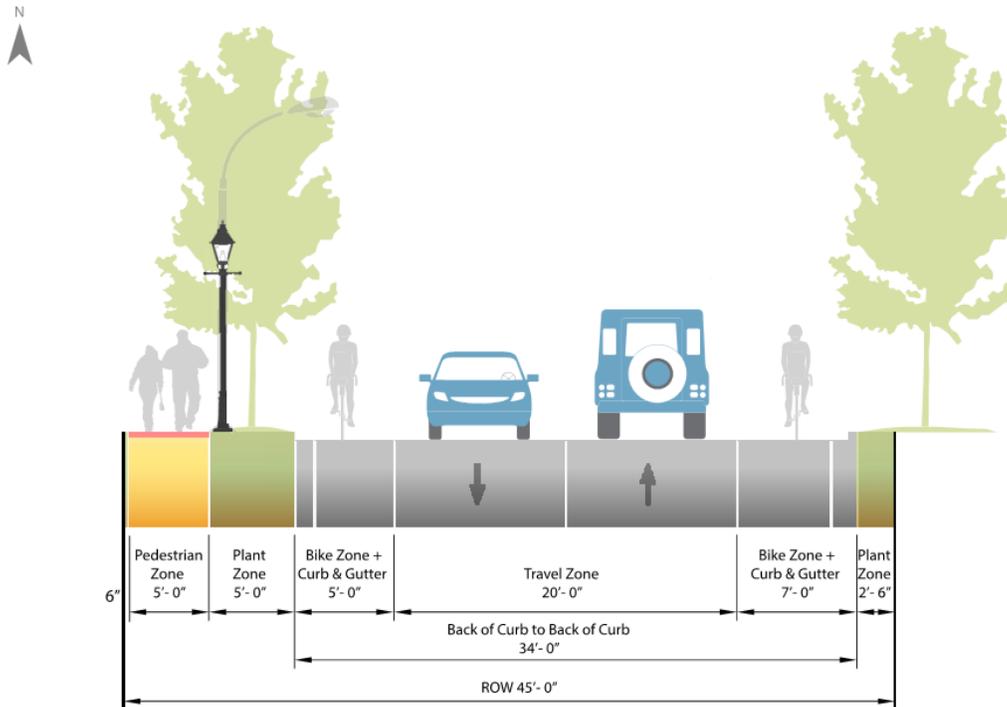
Proposed North Alexander St Complete Streets Cross Section (South of East Ascension St)
